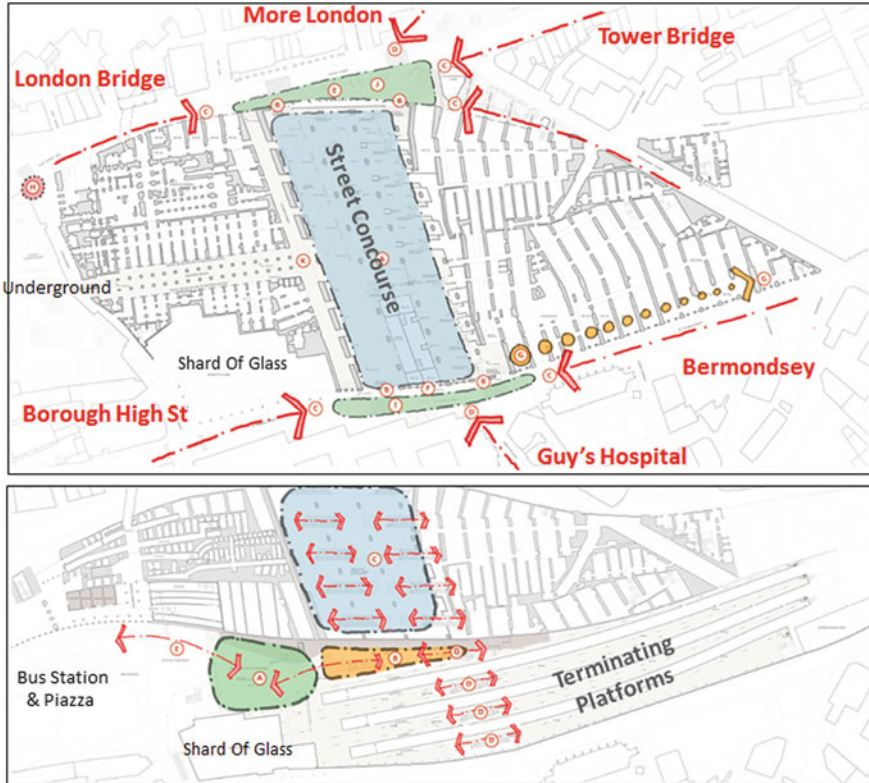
Proposed new London Bridge station layout at both street and bus station levels
